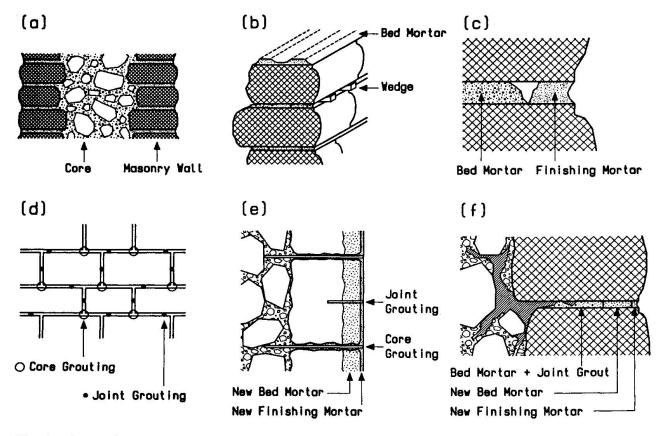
Natural stone masonry: (a) Vertical section through pier; (b) Placing of masonry blocks; (c) Bed joint; (d) Elevation showing grouting locations; (e) Plan view; (f) Cross-section through bed joint.
